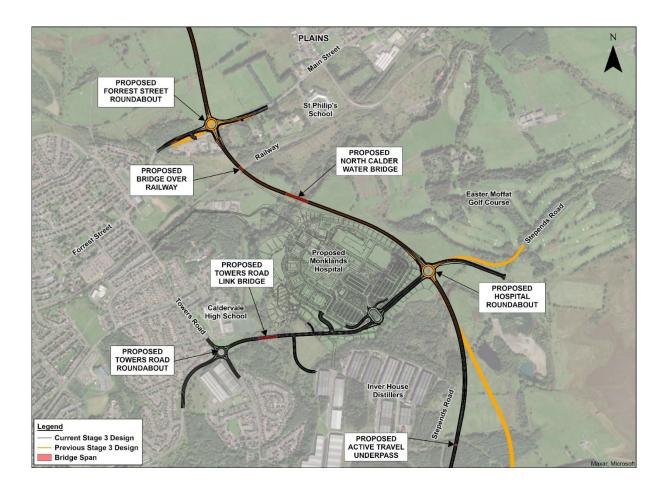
Proposed Towers Road Link and section of East Airdrie Link Road.
